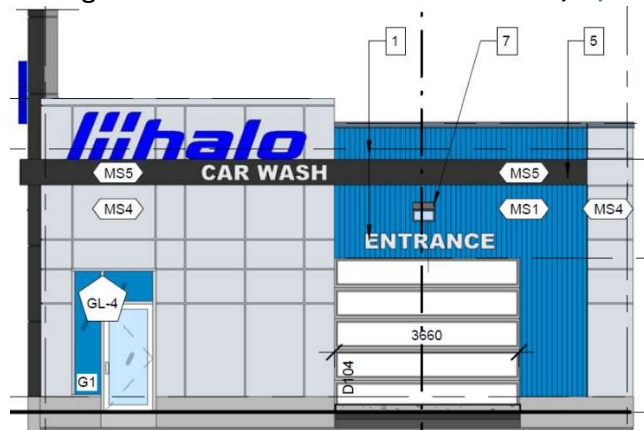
Exhibit M: West Elevation of the Building showing the entrance to the car wash tunnel and the vertical and horizontal projections on the west façade and north façade as well as the corporate branding
